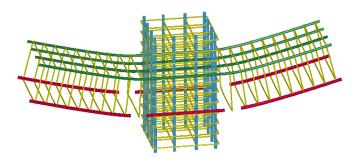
Failure mode from detailed model of the reinforced concrete assembly.
